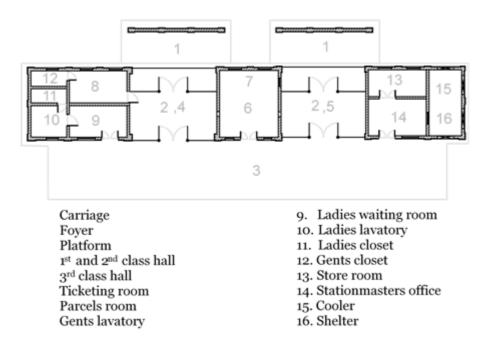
, plan view of the Badulla railway station (source: Survey department, architectural drawing no 06342)
